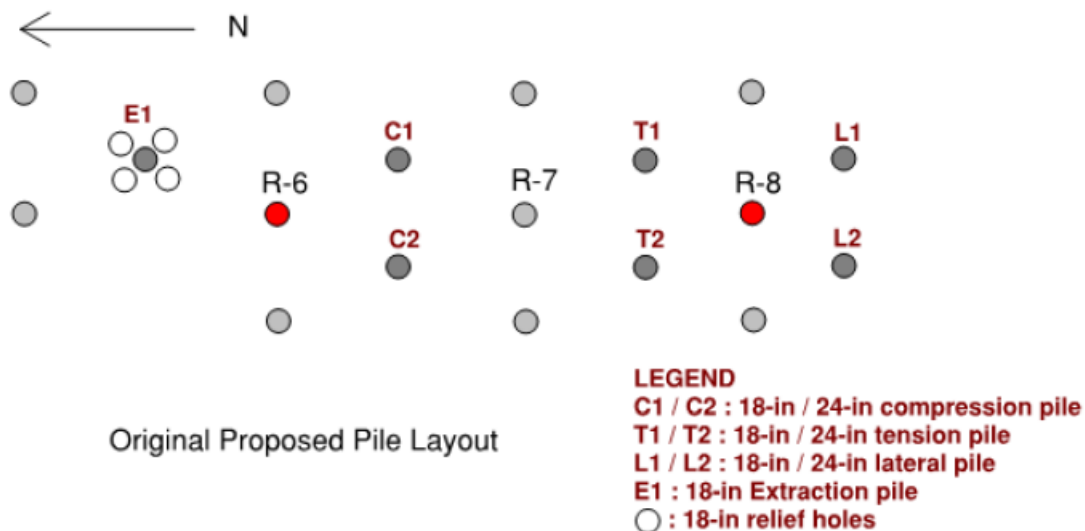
Original proposed DFI auger-cast test pile layout (DFI, 2017).
